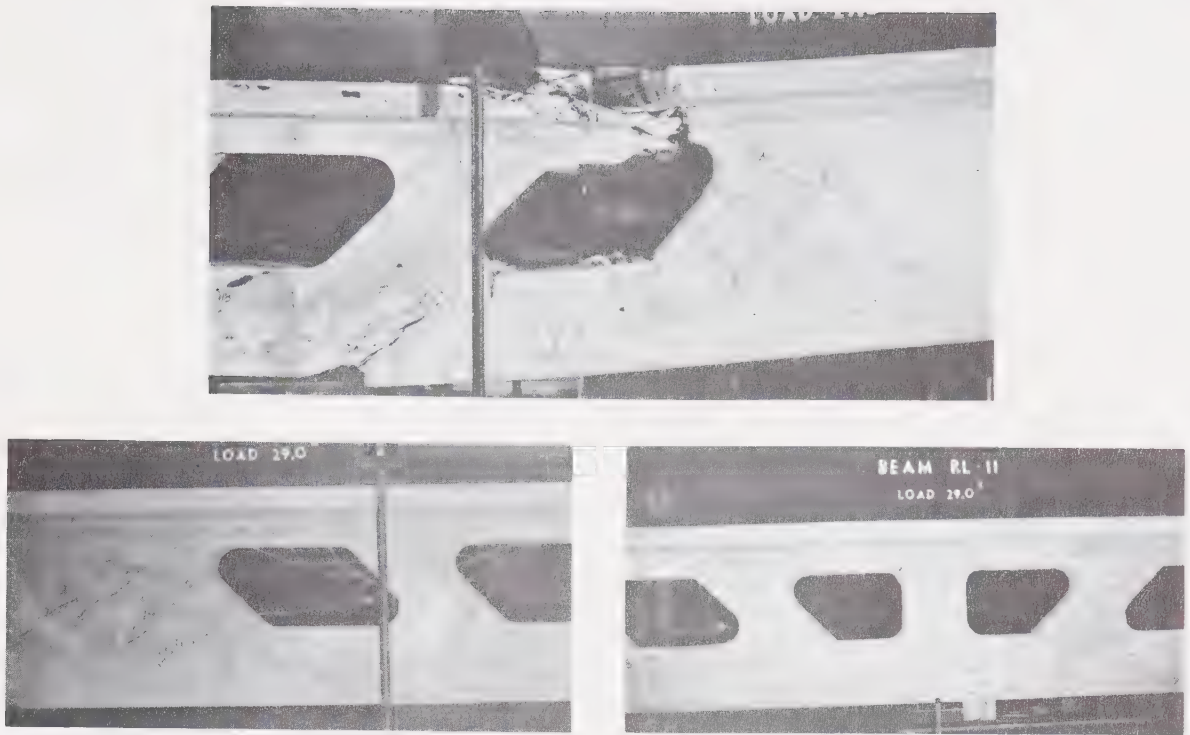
CRACKING AND FAILURE PATTERN OF BEAM 11-16-4-P
